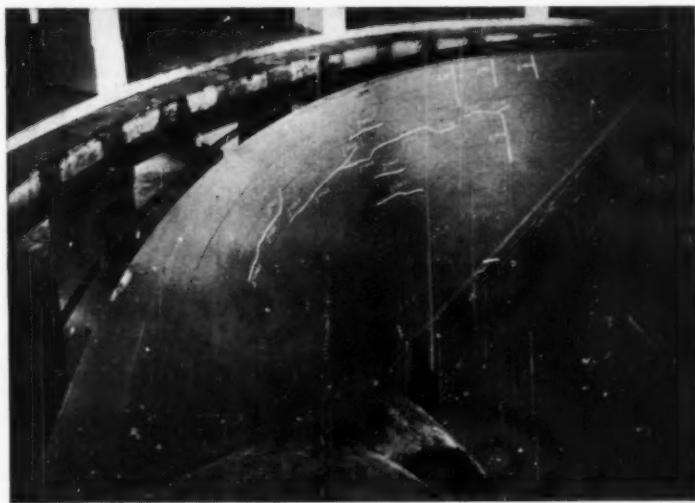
Model of a Dam, Showing Cracks after Test.
